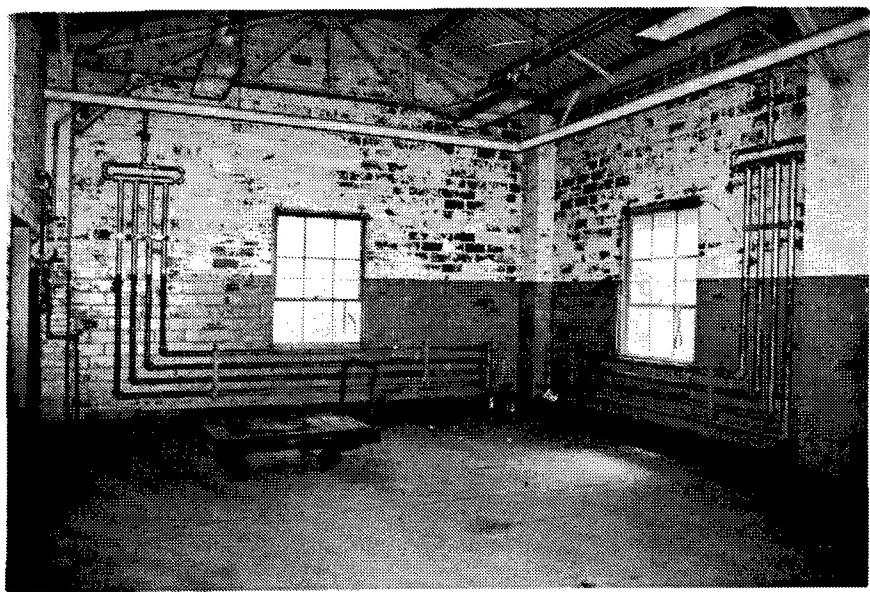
Building CA-21: Interior view of the TNT Box Building.
